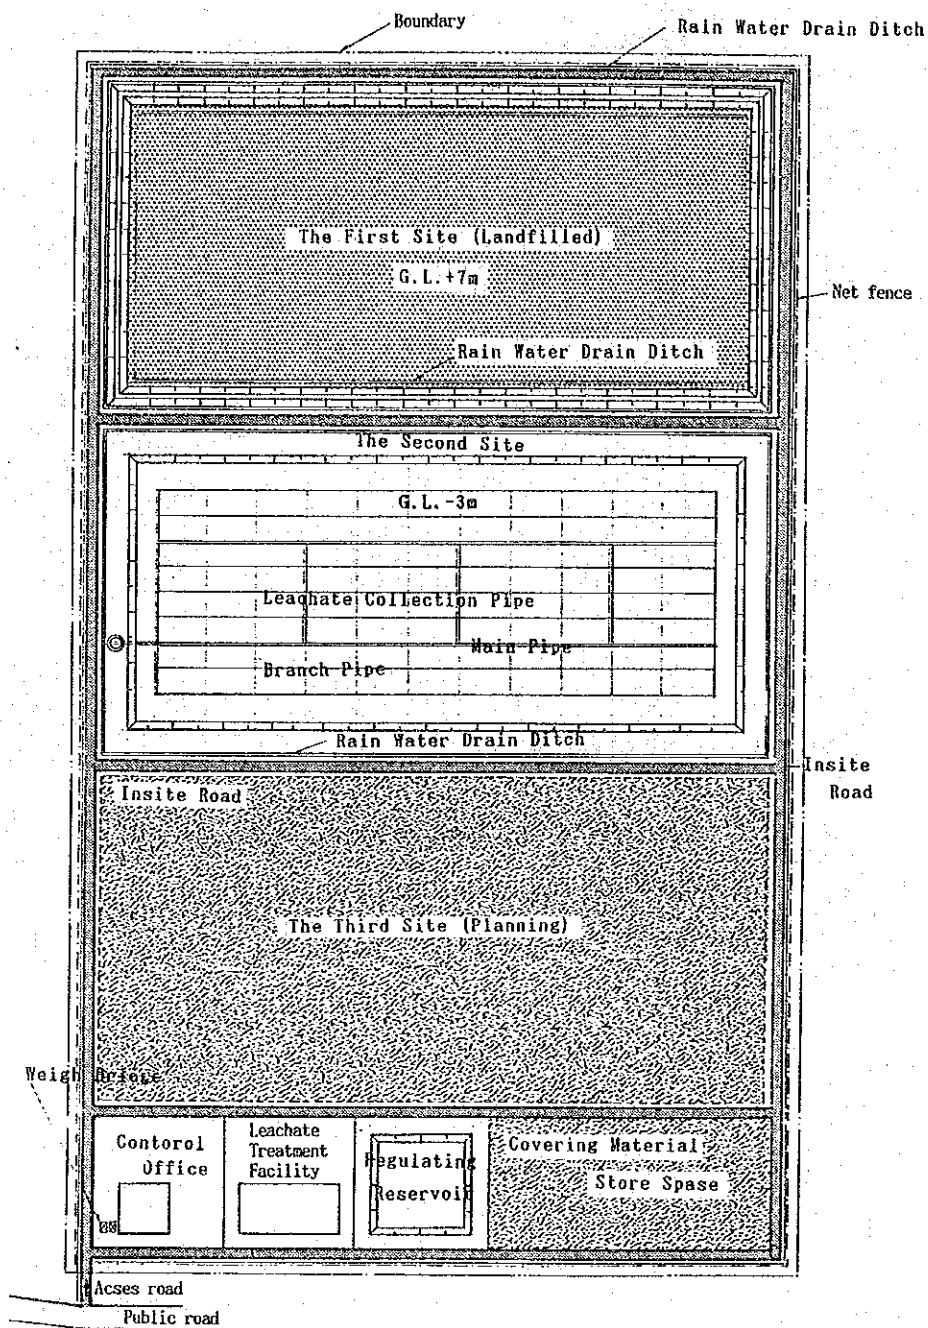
Layout Plan for the Sanitary Landfill in the East Part of Bangkok
